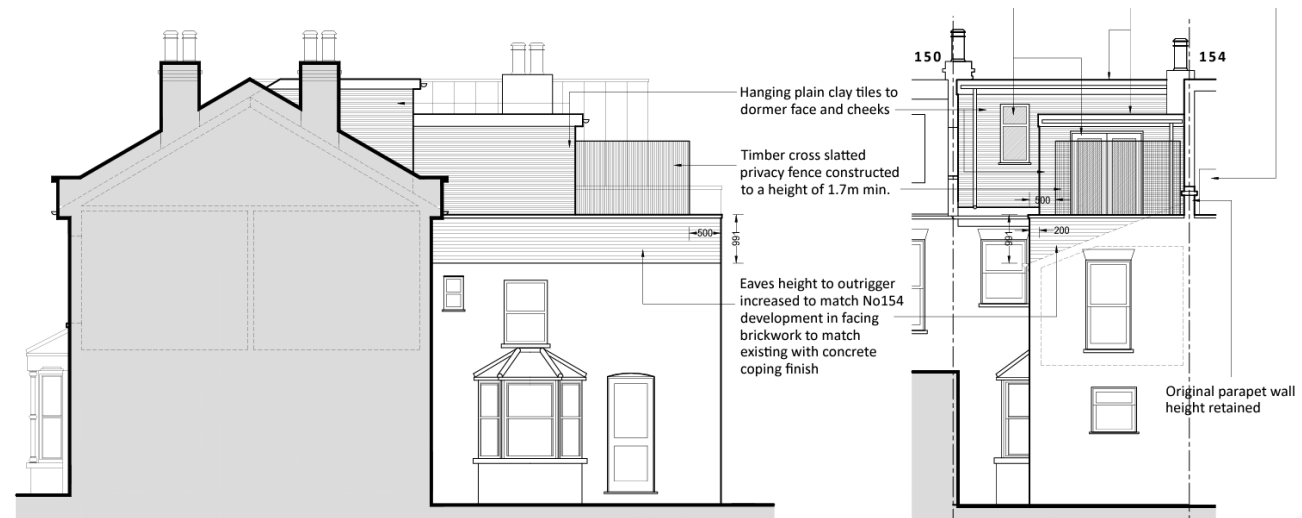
First Floor Flat 152 Lordship Lane, illustrating roof terrace (drawing by Studioe17)
